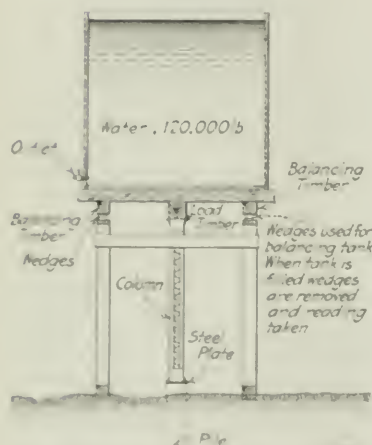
METHOD OF SUPPORTING 60-TON LOAD ON TEST PILE
